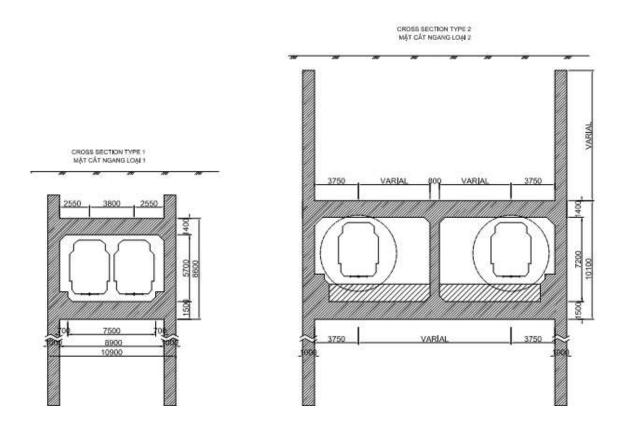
Cross Section of Box Tunnel Using Cut & Cover Method
